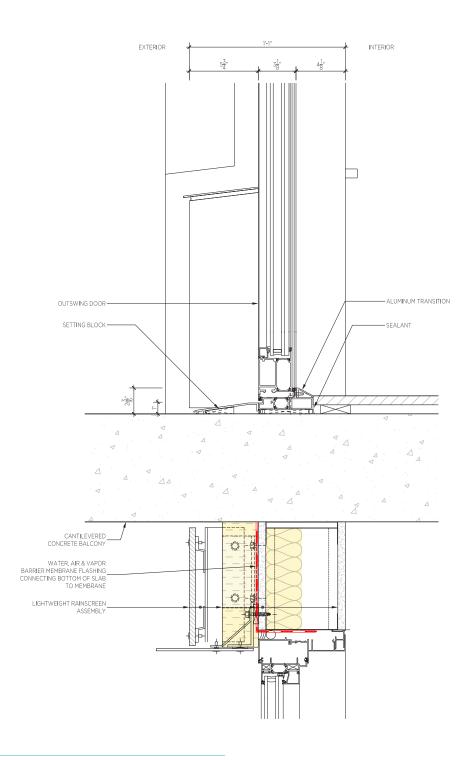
Base case Building - Lightweight rain screen at balcony cantilever and door sill
